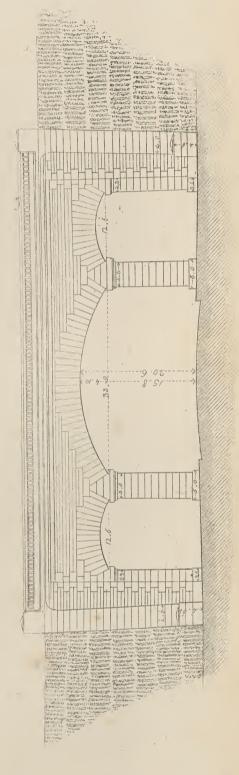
^b, exhibits further details of the same bridge, viz., a transverse section through the centre of the main arch; the detailed elevation of the foot of the wing wall; the detail of the string course at the springing of the arches; an enlarged plan of the counterfort, with a general
